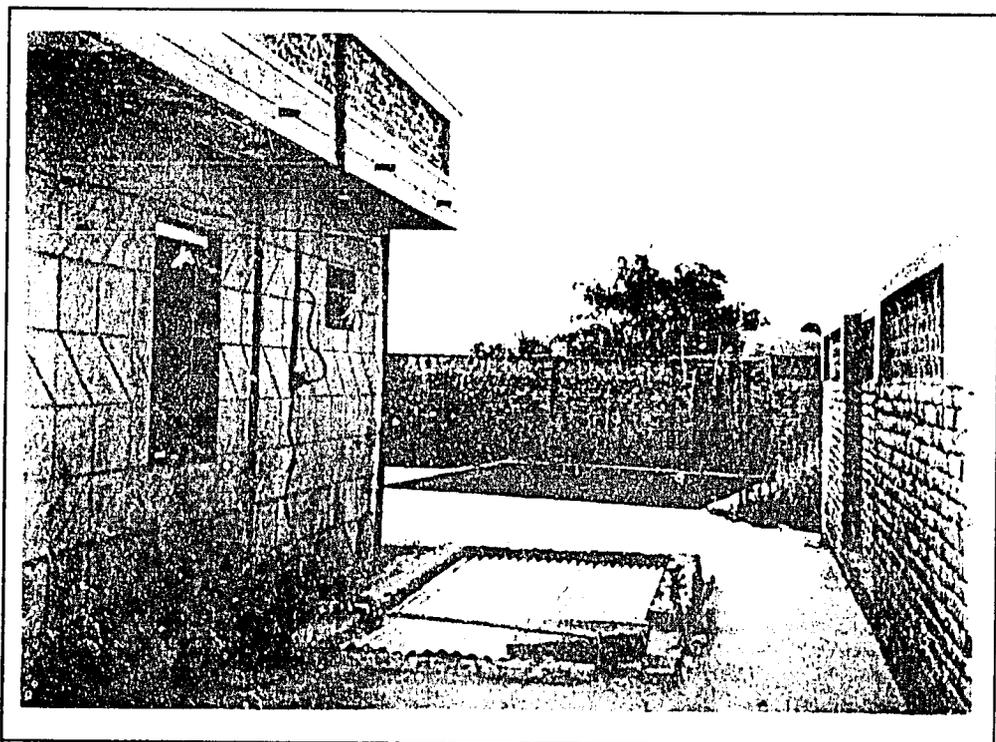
Quetta HF Base Station Antenna Site. Right section of building facing North.
